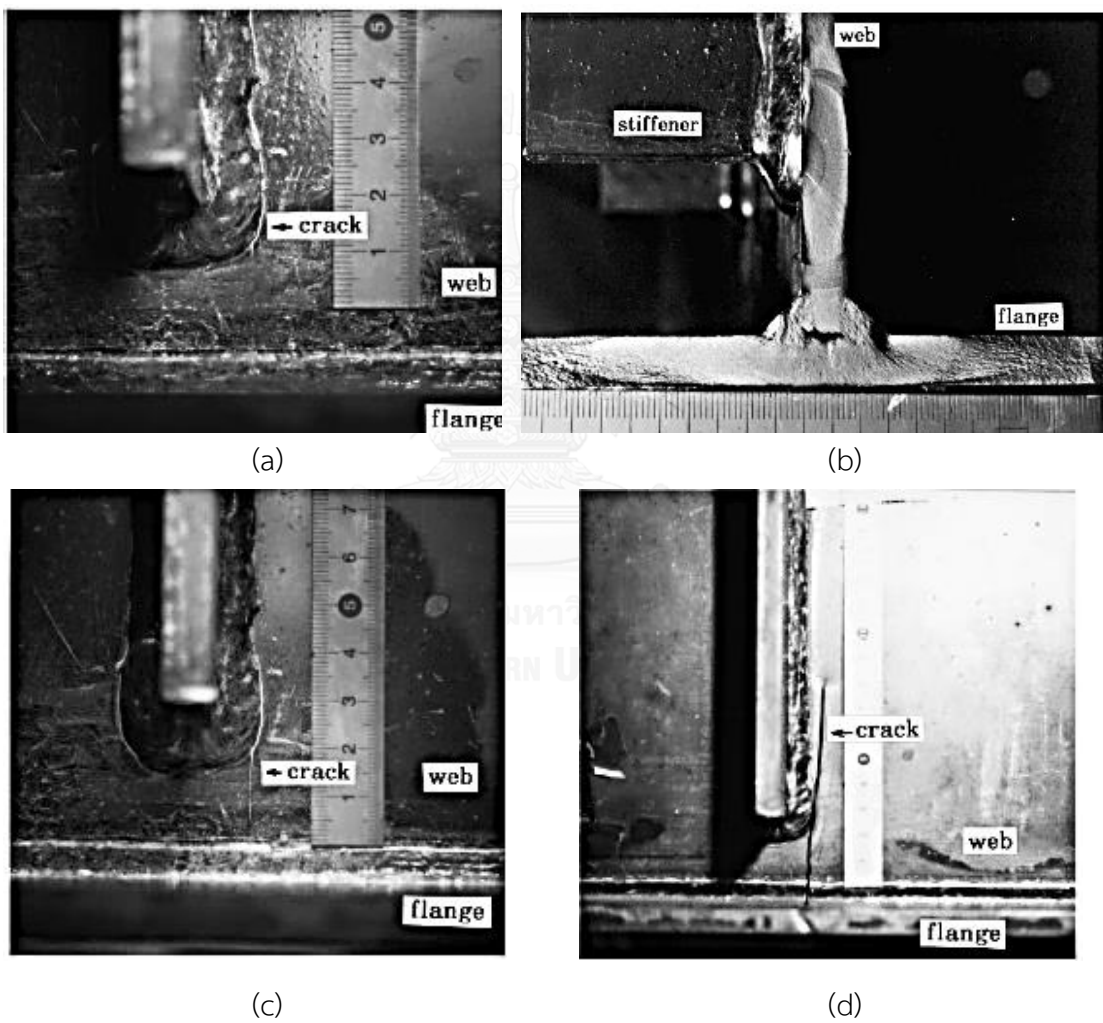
fatigue crack propagation (a) fatigue crack initiation (b) cross section at initial stage (c) growing crack (d) failure of flange [7]
